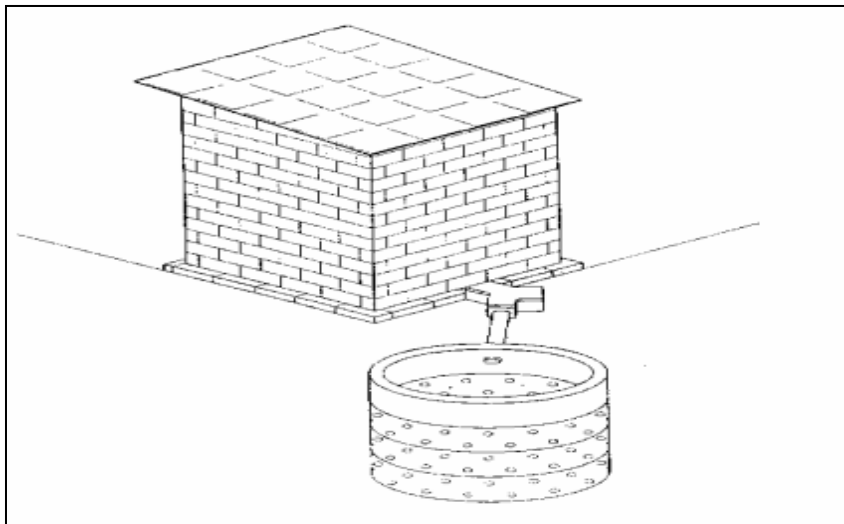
WaterAid India's criteria for a completely constructed and functional latrine - brick structure (3.6 ft. width, 4 ft. length and 5 ft. height); door; single pit and chamber connection for second pit, ring pit with cover plate (WaterAid India, 2010)
